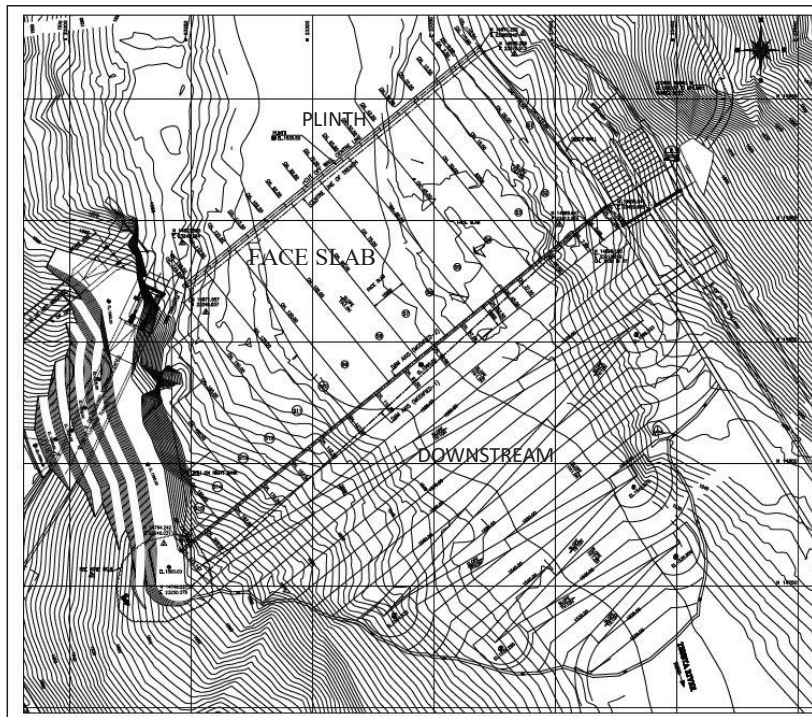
Teesta Hydropower Project Stage III : Layout of CFRD
